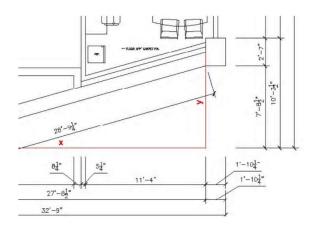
An example of dimensioning an angled wall along an x and a y axis.
